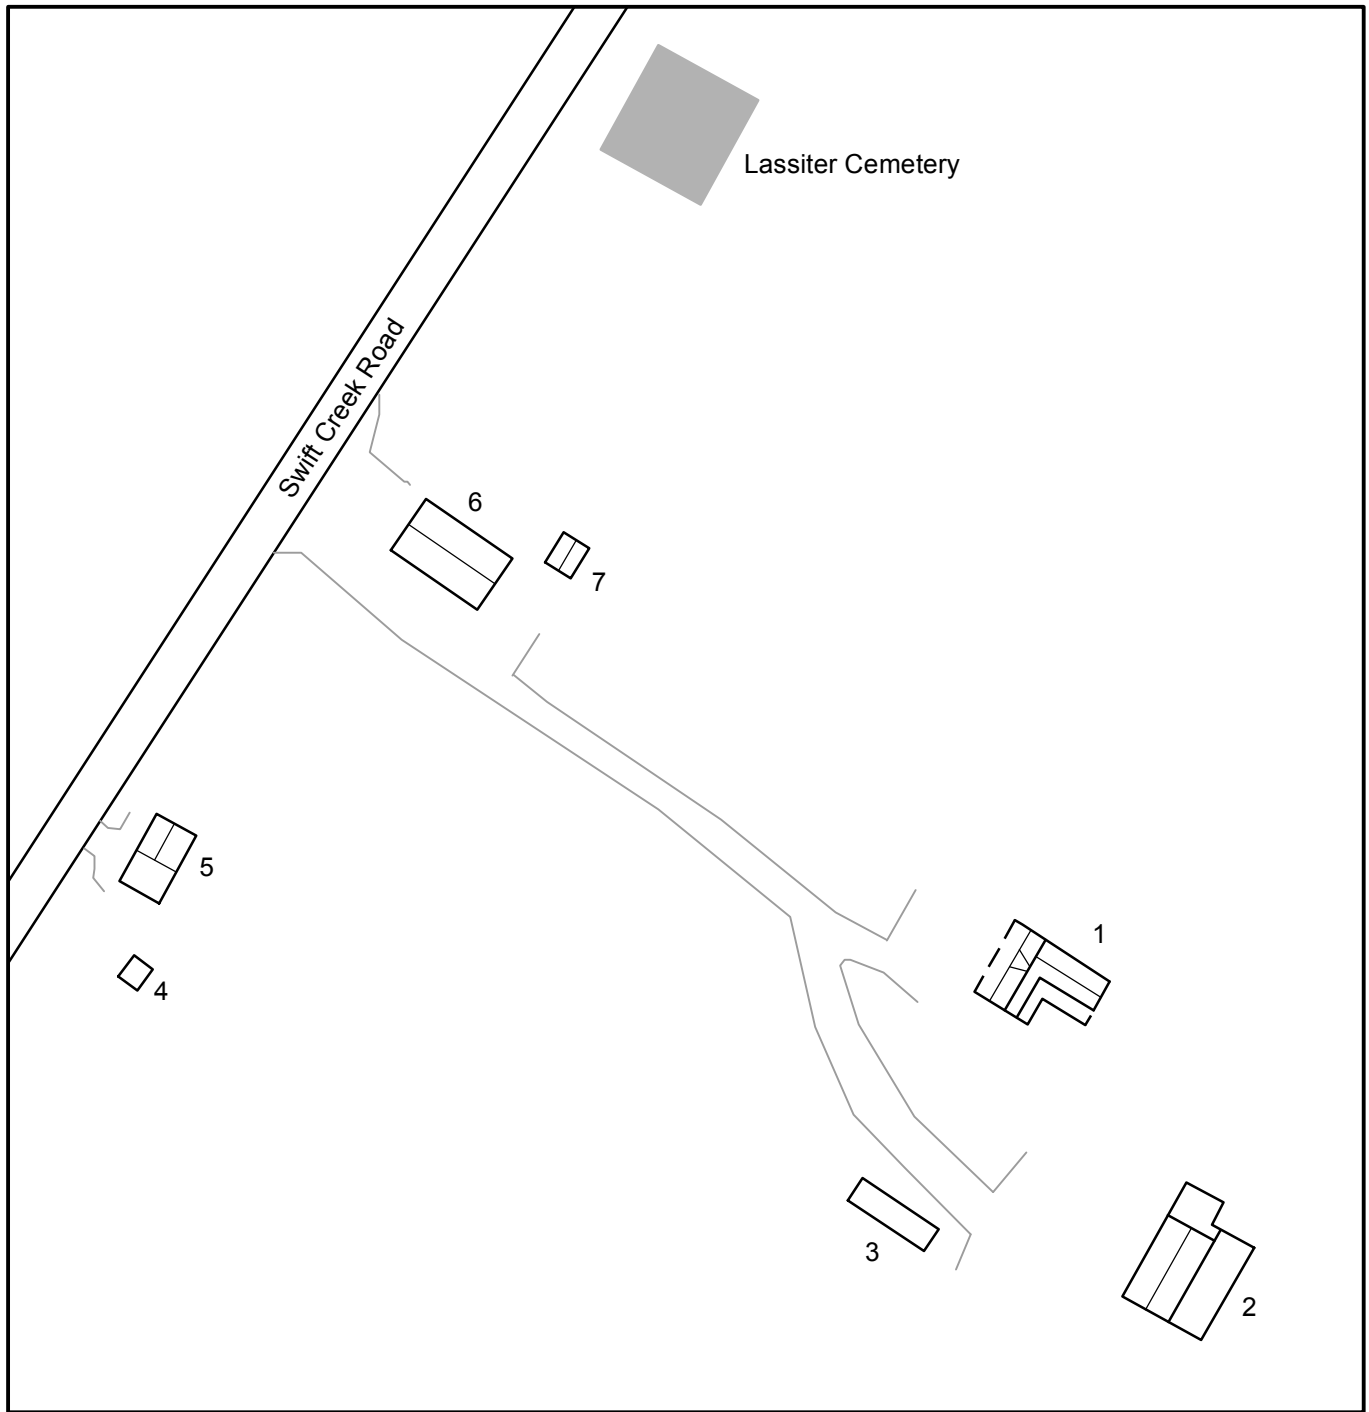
Site plan of Jones Farm (#3), PIN: 168600-94-1187.
